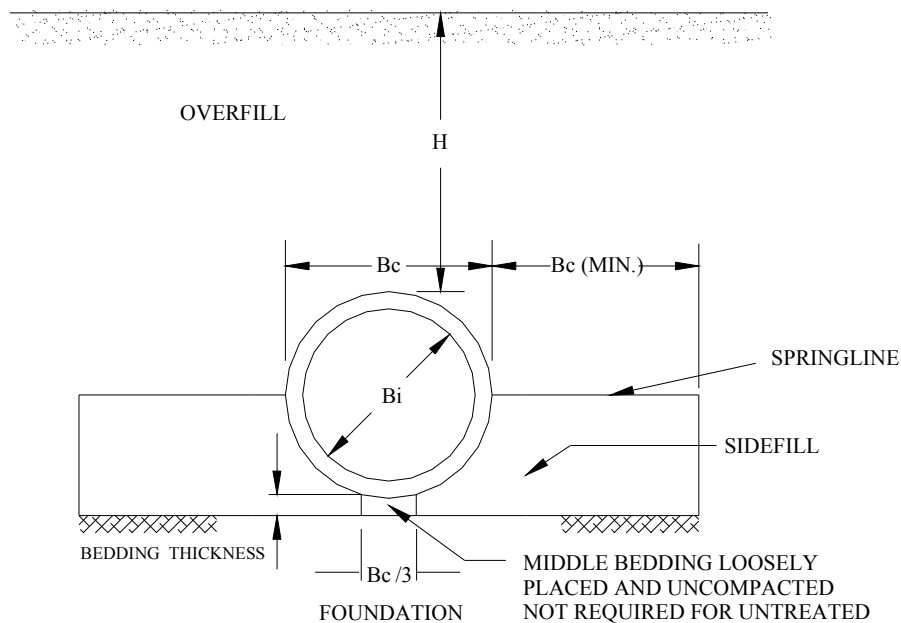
Proposed Embankment Installations for Concrete Round Pipes
